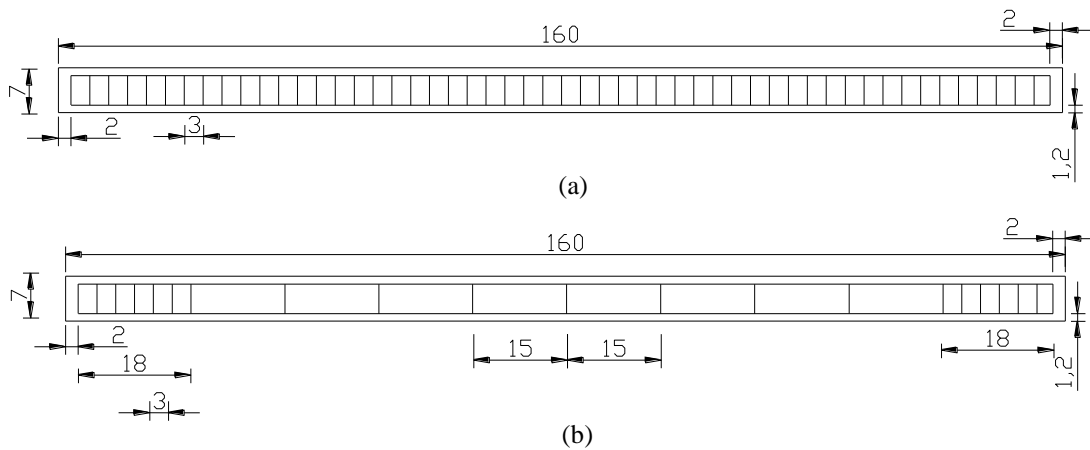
Reinforcement details (a) reinforced concrete model pile (b) concrete with only bending reinforcement and concrete with bending reinforcement and steel fiber model pile
